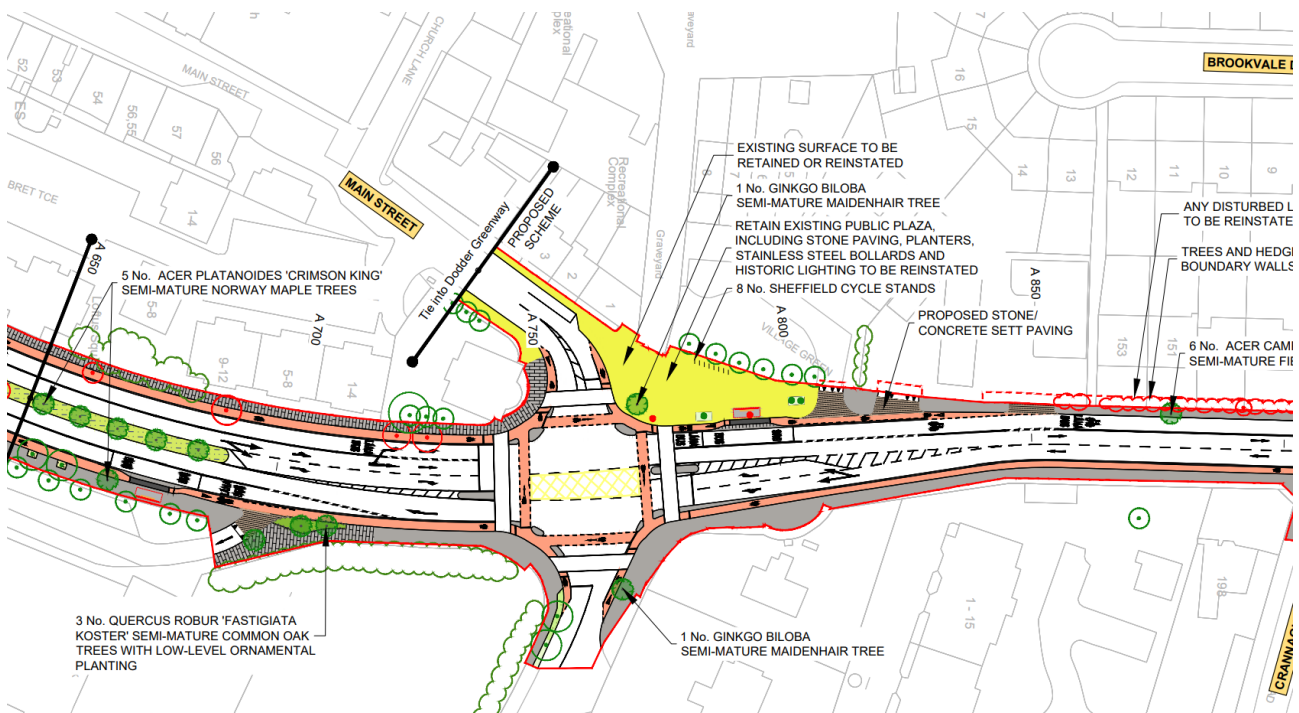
Extract from Landscape General Arrangement Drawings at Main Street Rathfarnham / Rathfarnham Road junction
